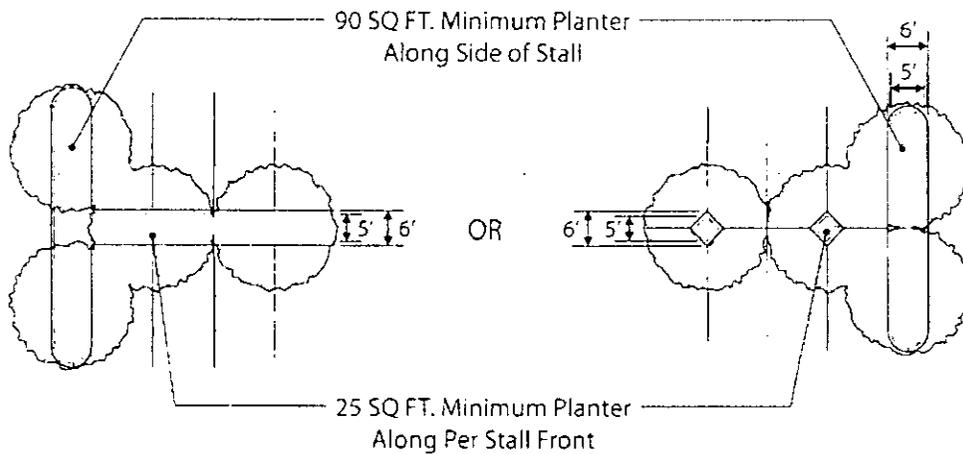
PARKING LOT PLANTER DESIGN
